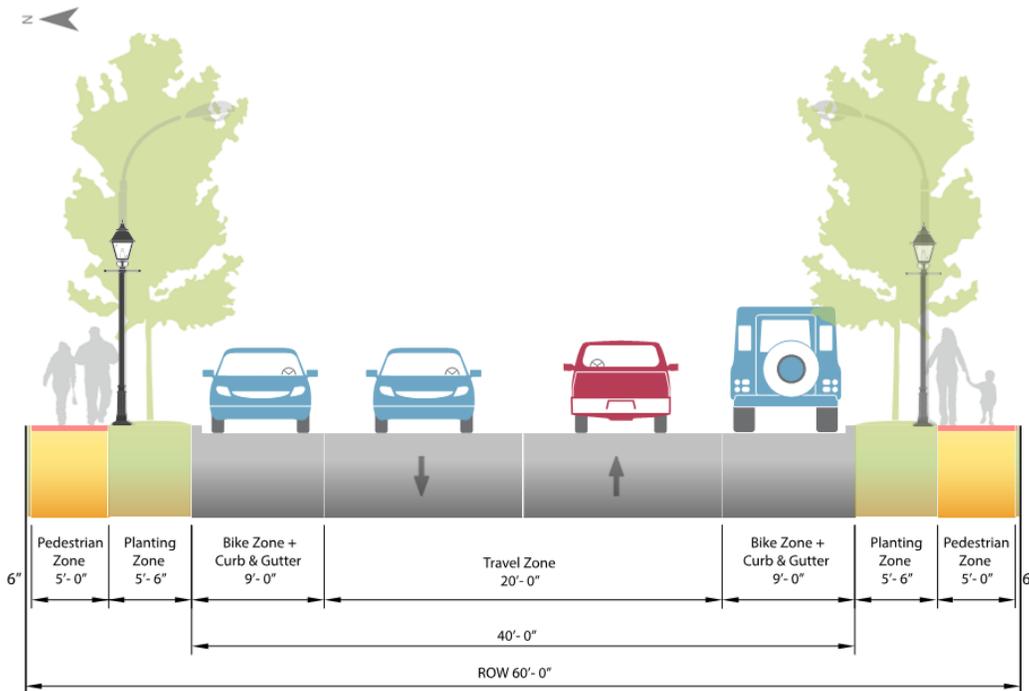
Proposed East Ascension St Complete Street Cross Section
